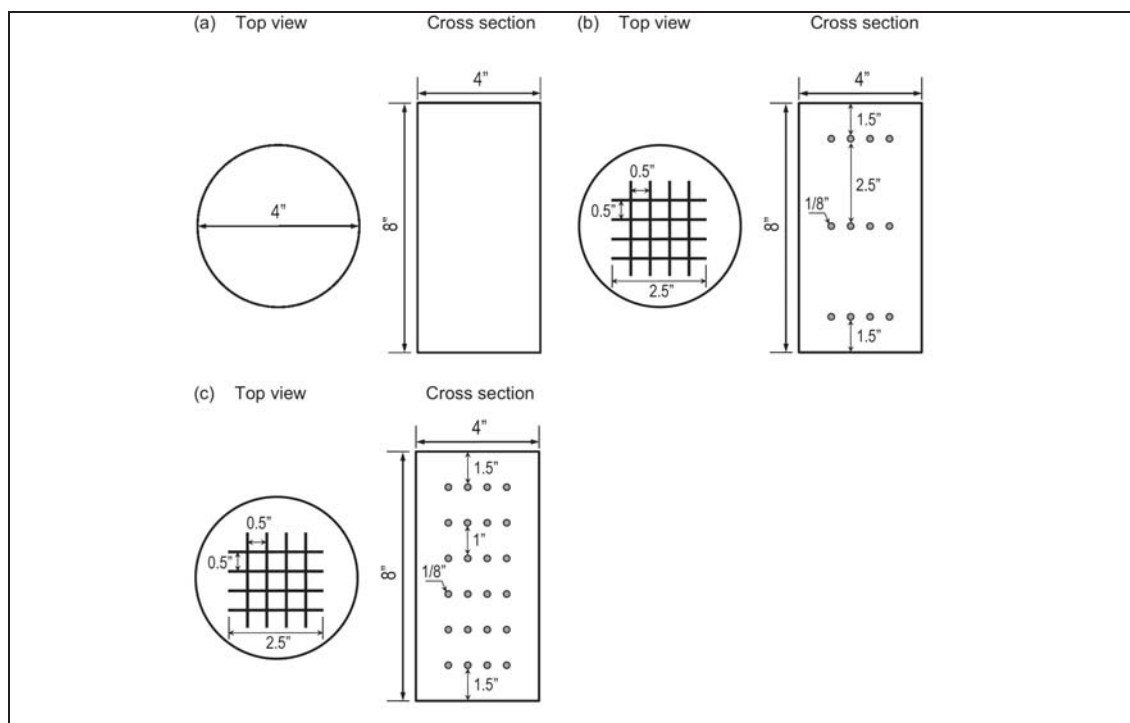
Elastomeric concrete cylinders: a) without steel wires; b) with 0.5% steel wires; and c) with 1% steel wires.
